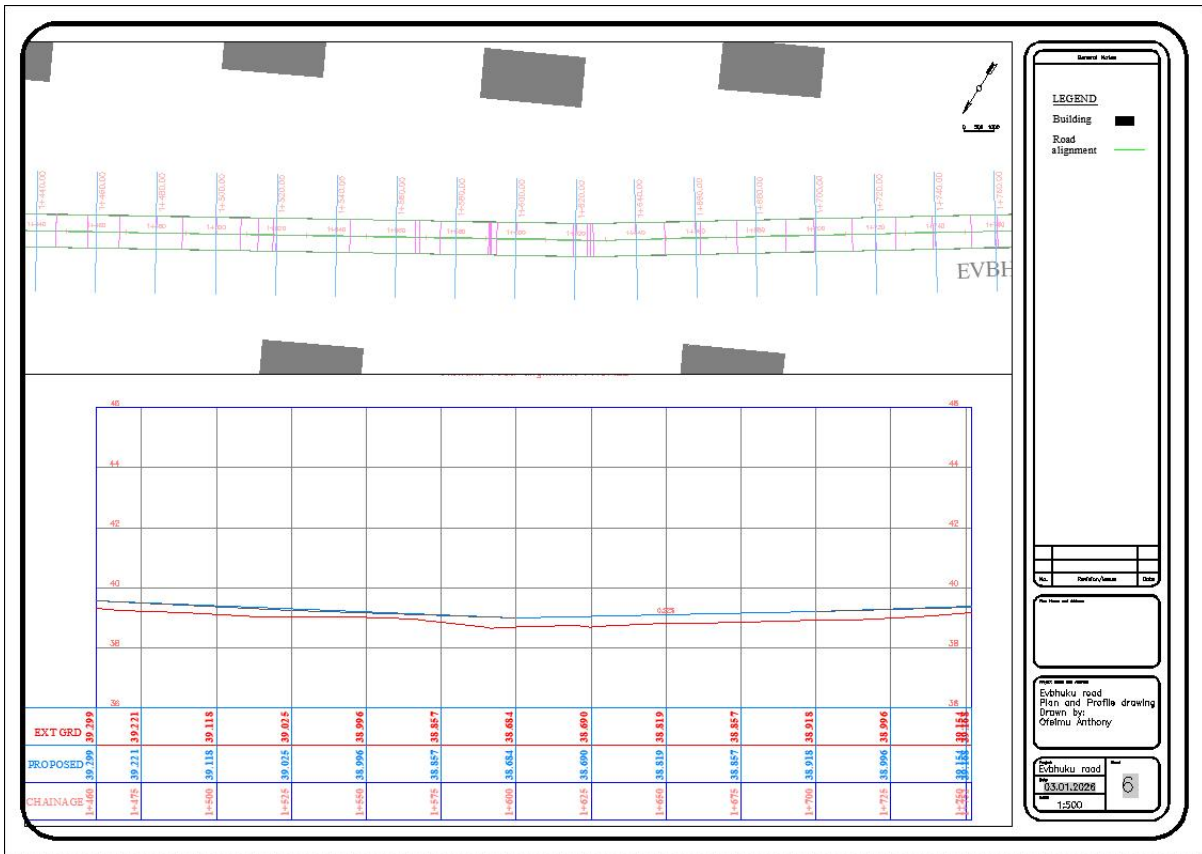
Plan and Profile Drawing (1+480 – 1+752)
